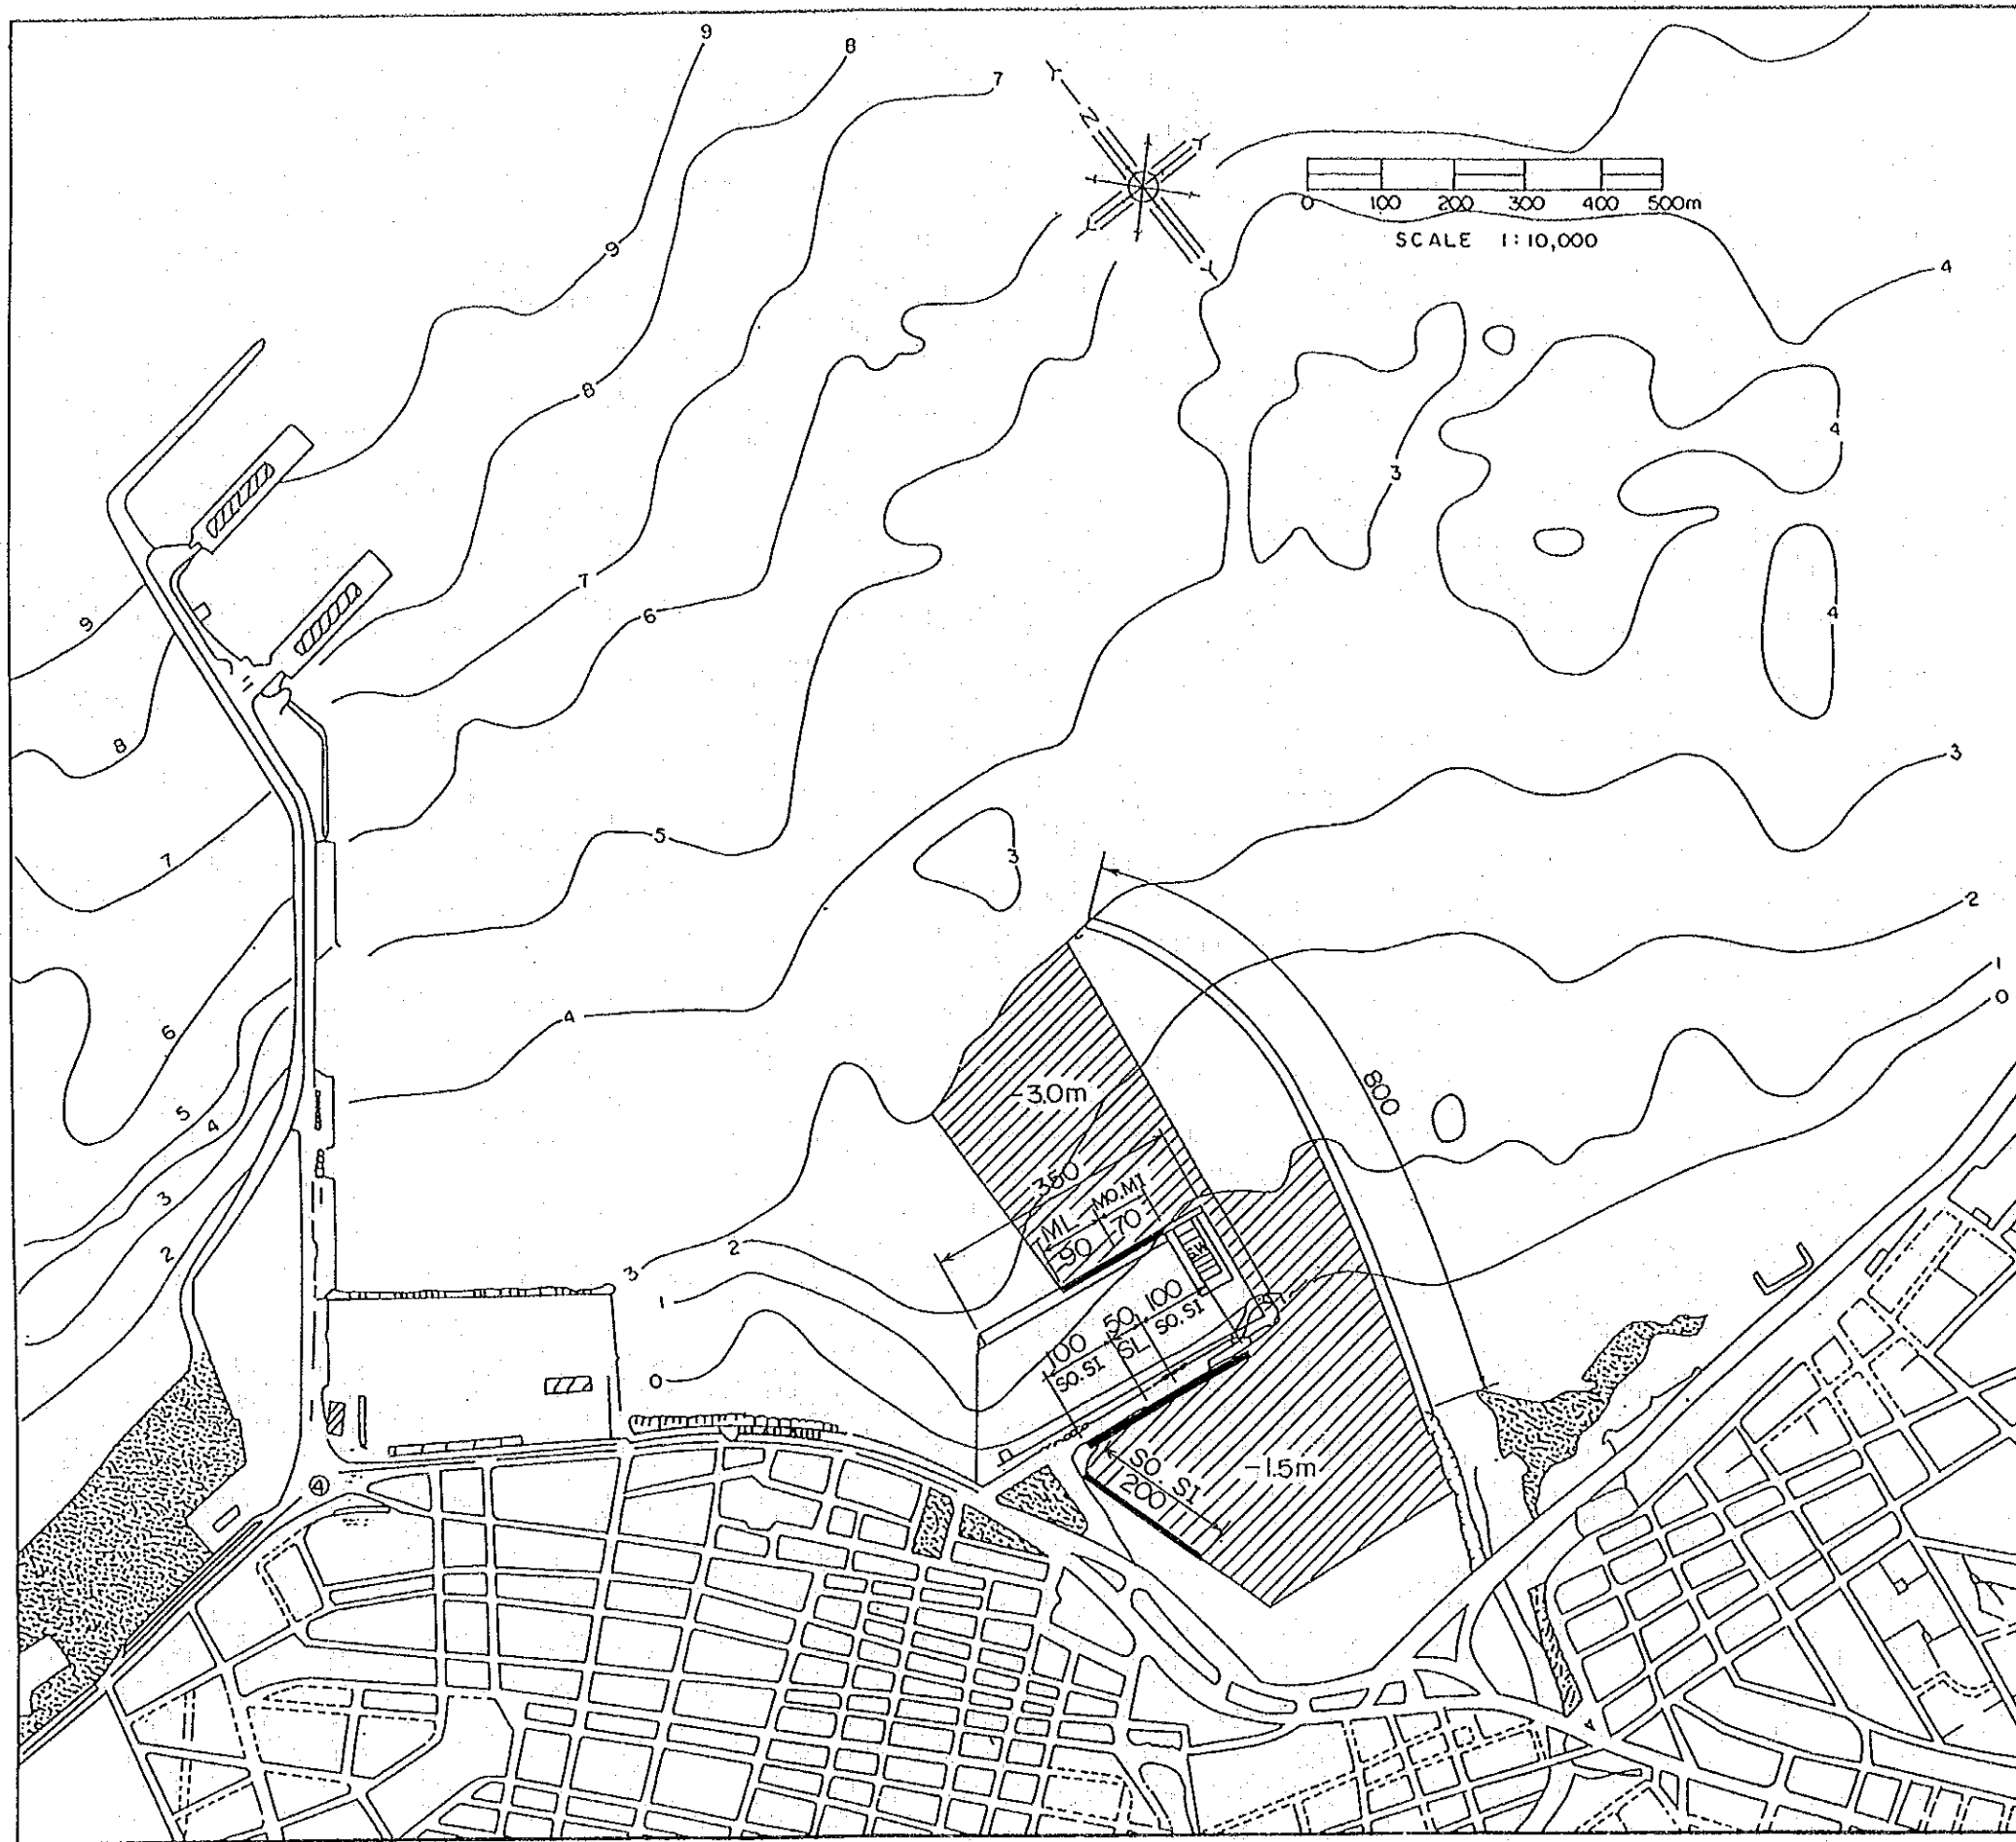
Short-Term Development Plan Alternative-3 for Manta
